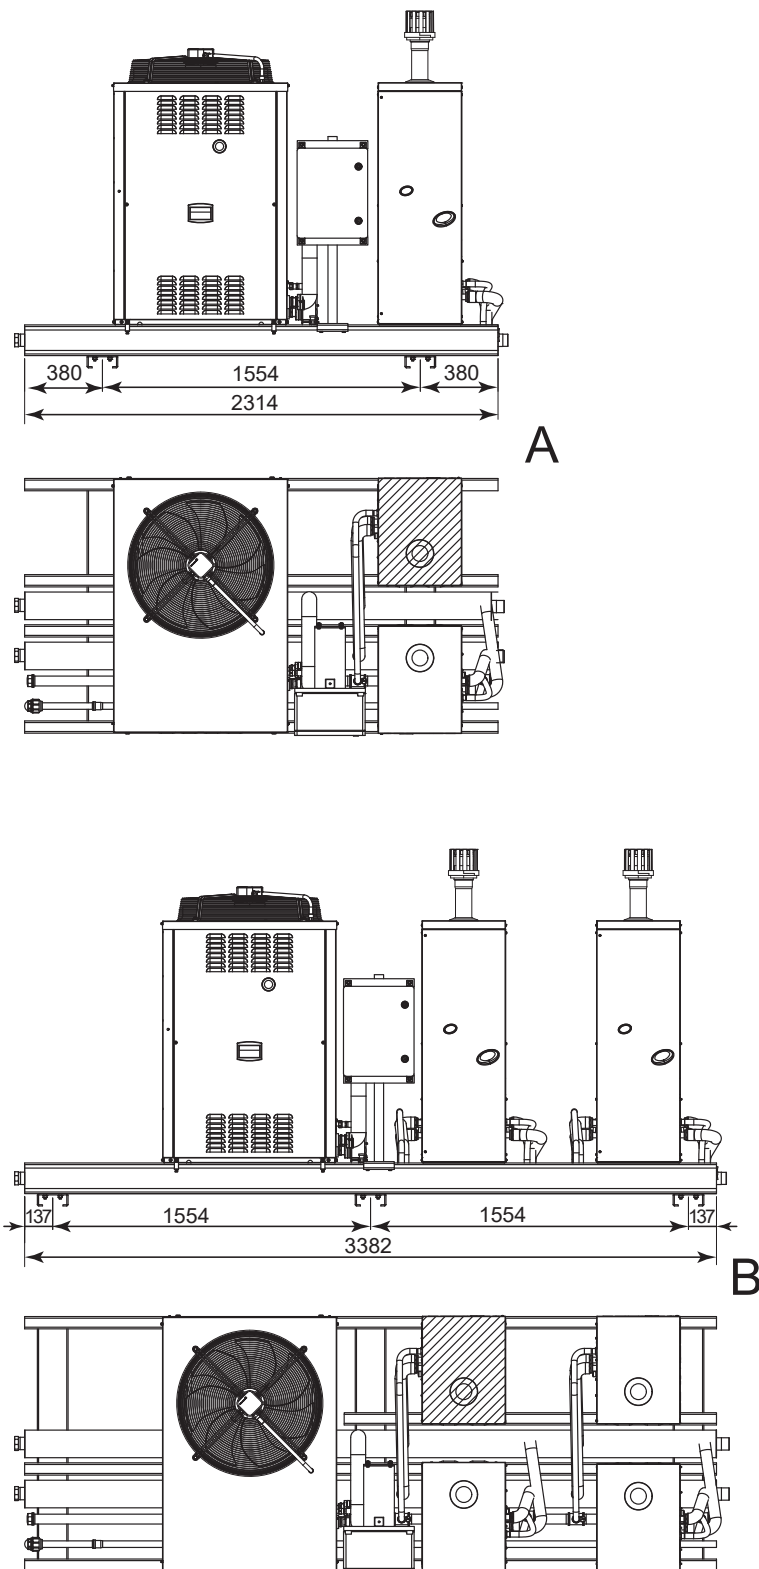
Dimensions and weights of AY preassembled group (with 2, 3, 4 and 5 units) - front view
